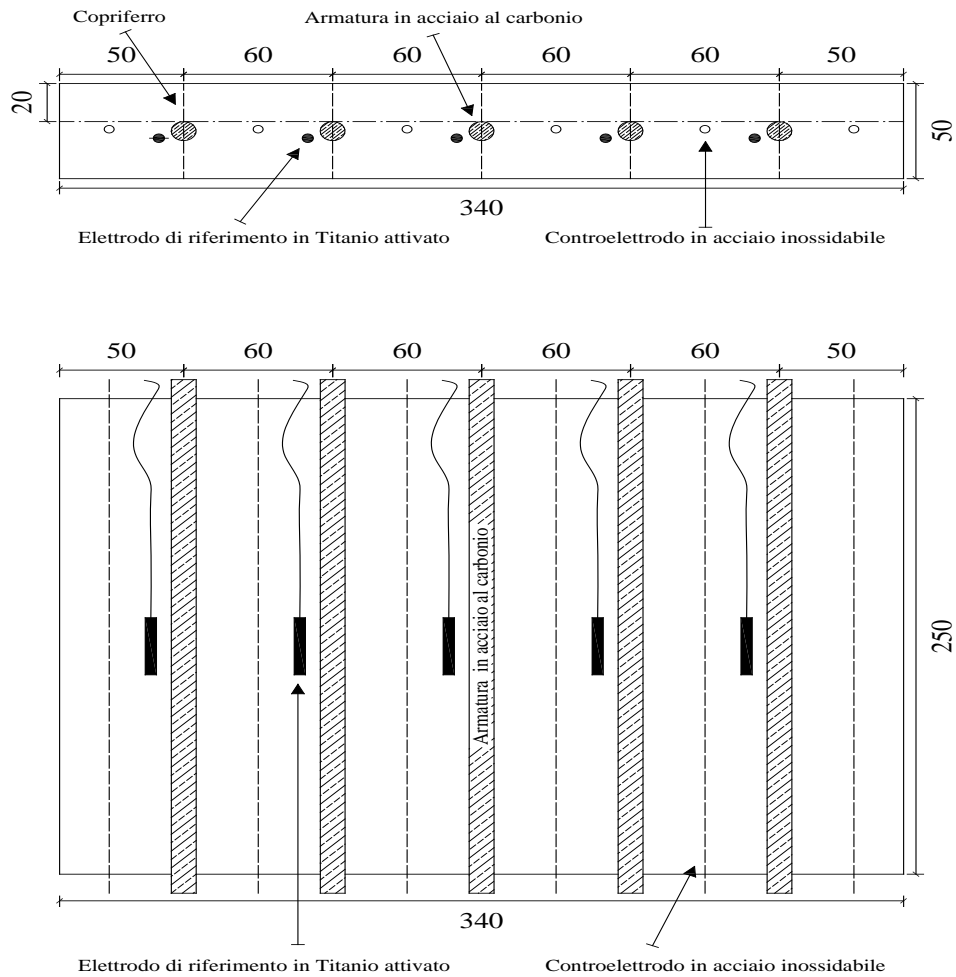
1: Cross section and top view of a concrete specimen type 1.
